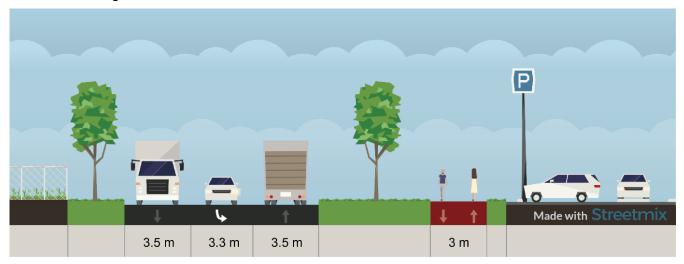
Design Alternative #4 - Raised Cycle Tracks and Sidewalks
